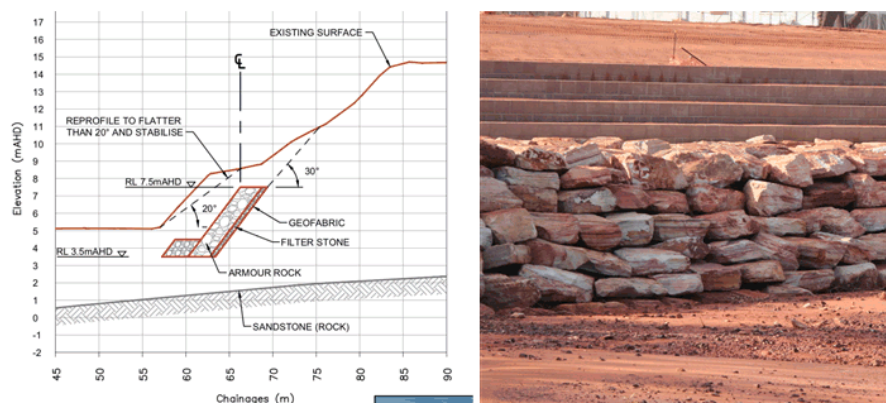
Typical section of Option 1 (left) and example low crested revetment (right).
